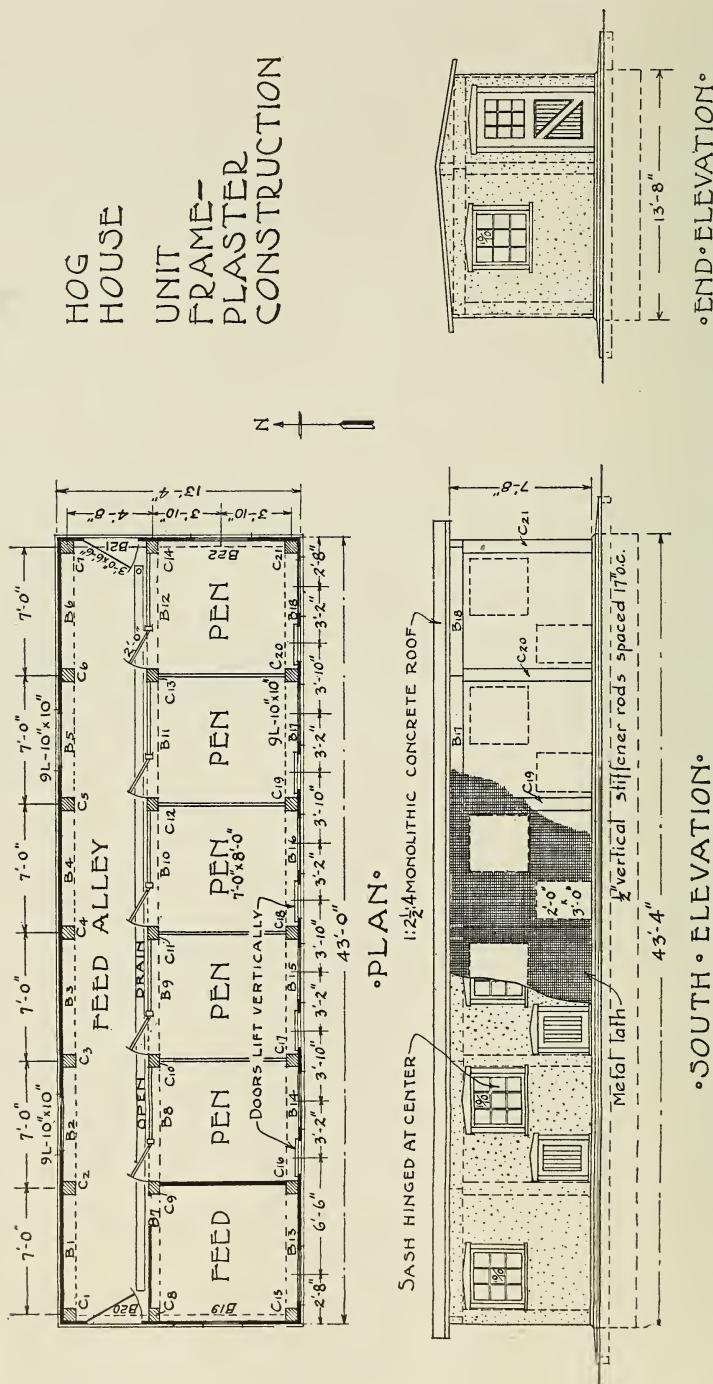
Plan and Elevation of a Cement Plaster Hog House with Reinforced Concrete Frame.
